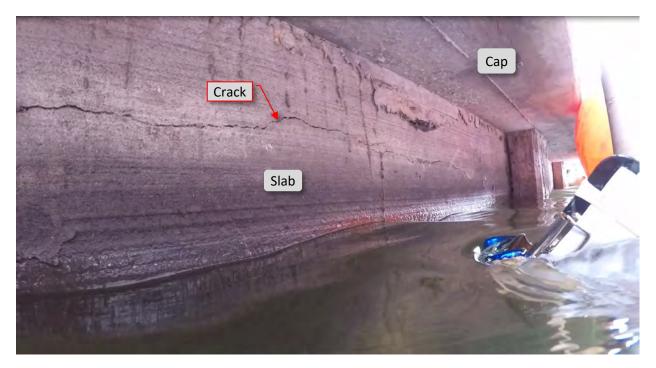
S18. STA 4+54 - 4+59. Crack at top of slab.
